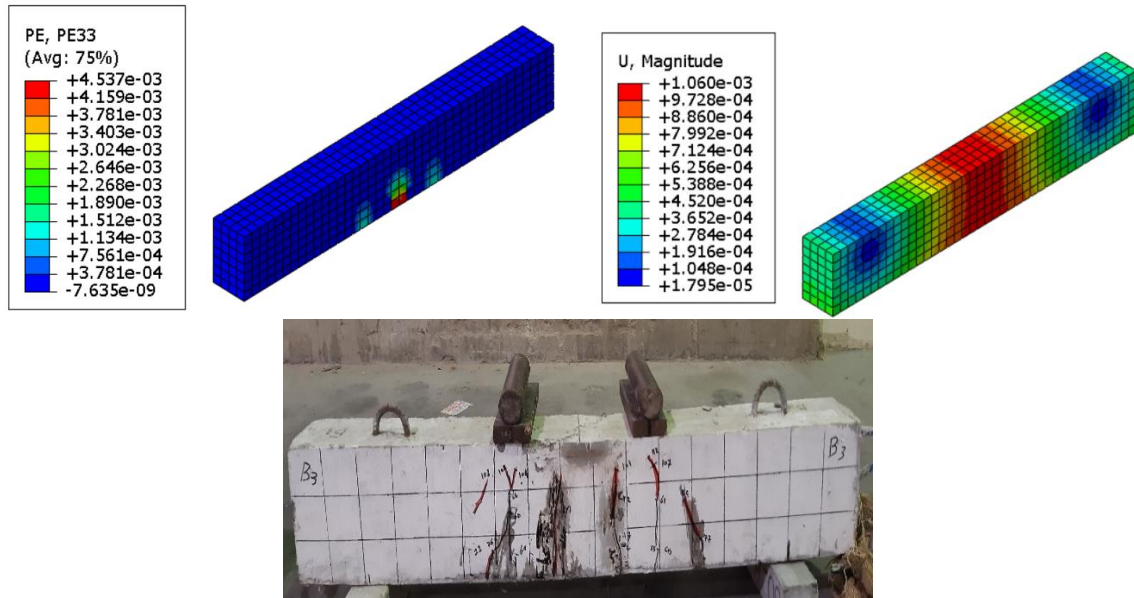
Deflection and plastic strain in Concrete Beam B3
